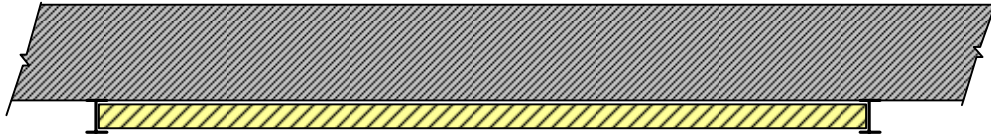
Wall 3 (Foil-faced polyisocyanurate (1.5"))
